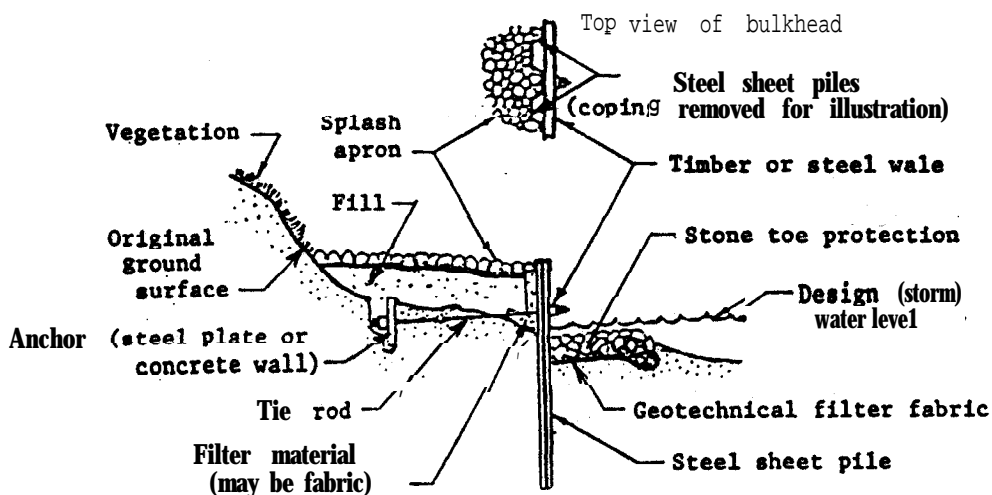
Anchored Steel Sheet-Pile Bulkhead
